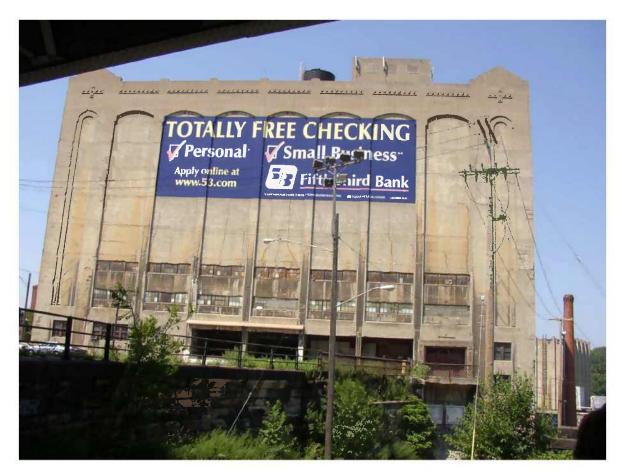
Warehouse (cold storage) west of I-90 on University Avenue. Photo is looking at the east wall of the warehouse (BBCM, 2005b).
